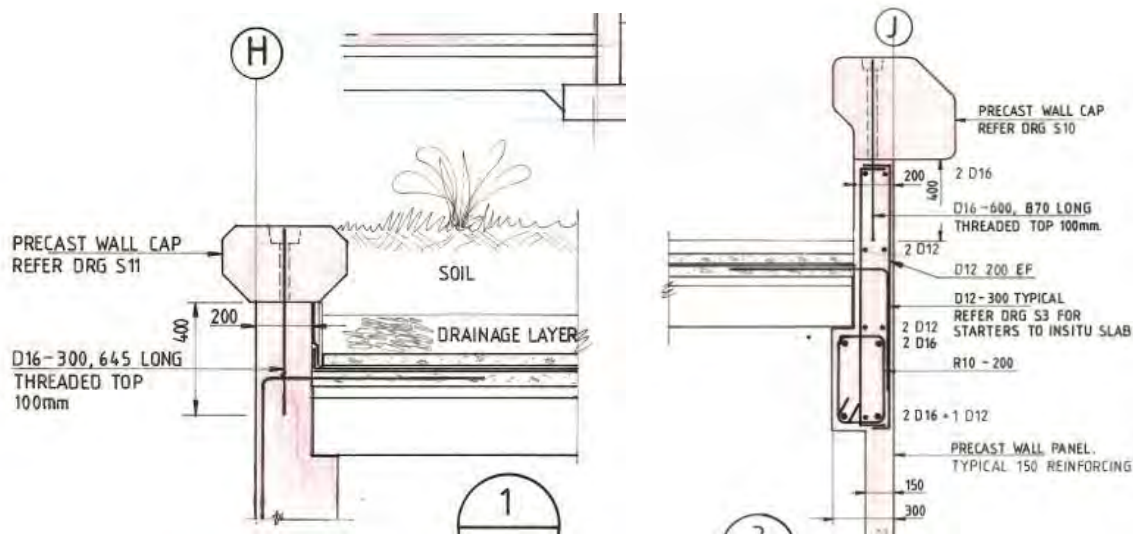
Extract from as built drawing S4 - showing typical wall cap types and connection detail between the wall cap and precast concrete wall panel
